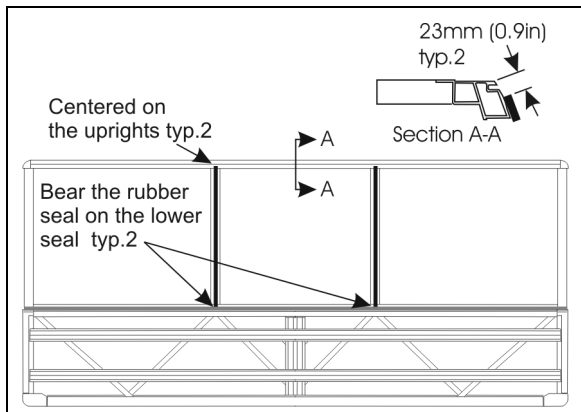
FACE FIXED WINDOWS - RUBBER SEAL INSTALLATION
